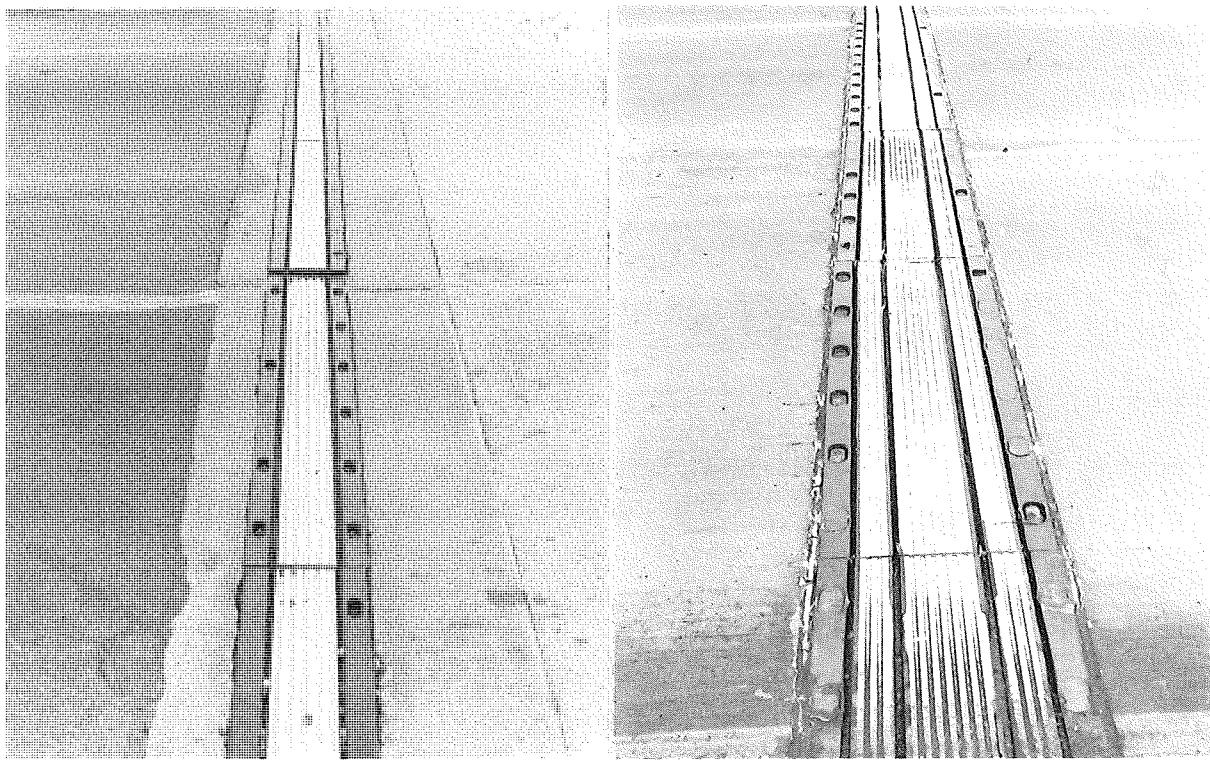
Waboflex installations showing vertical misalignment between pads (left) and missing stud well plugs (right).
